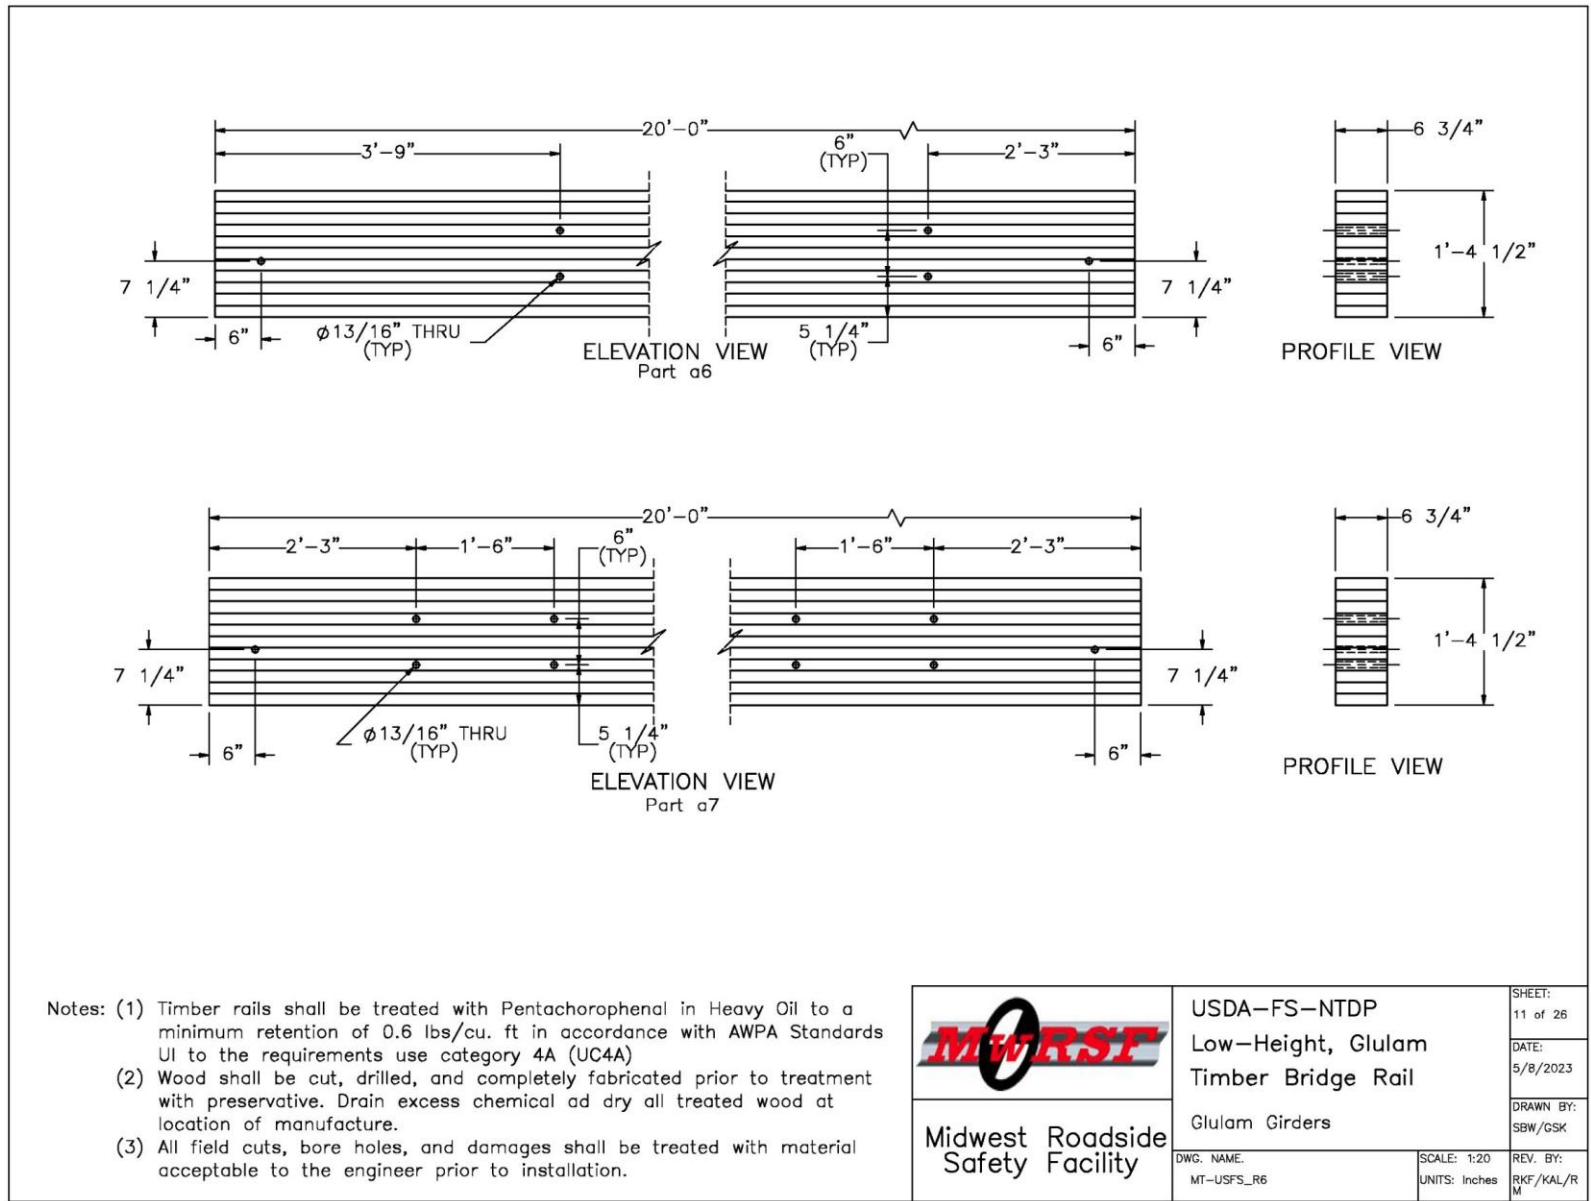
USDA-FS-NTDP Low-Height, Glulam Timber Bridge Rail: Glulam Girders
